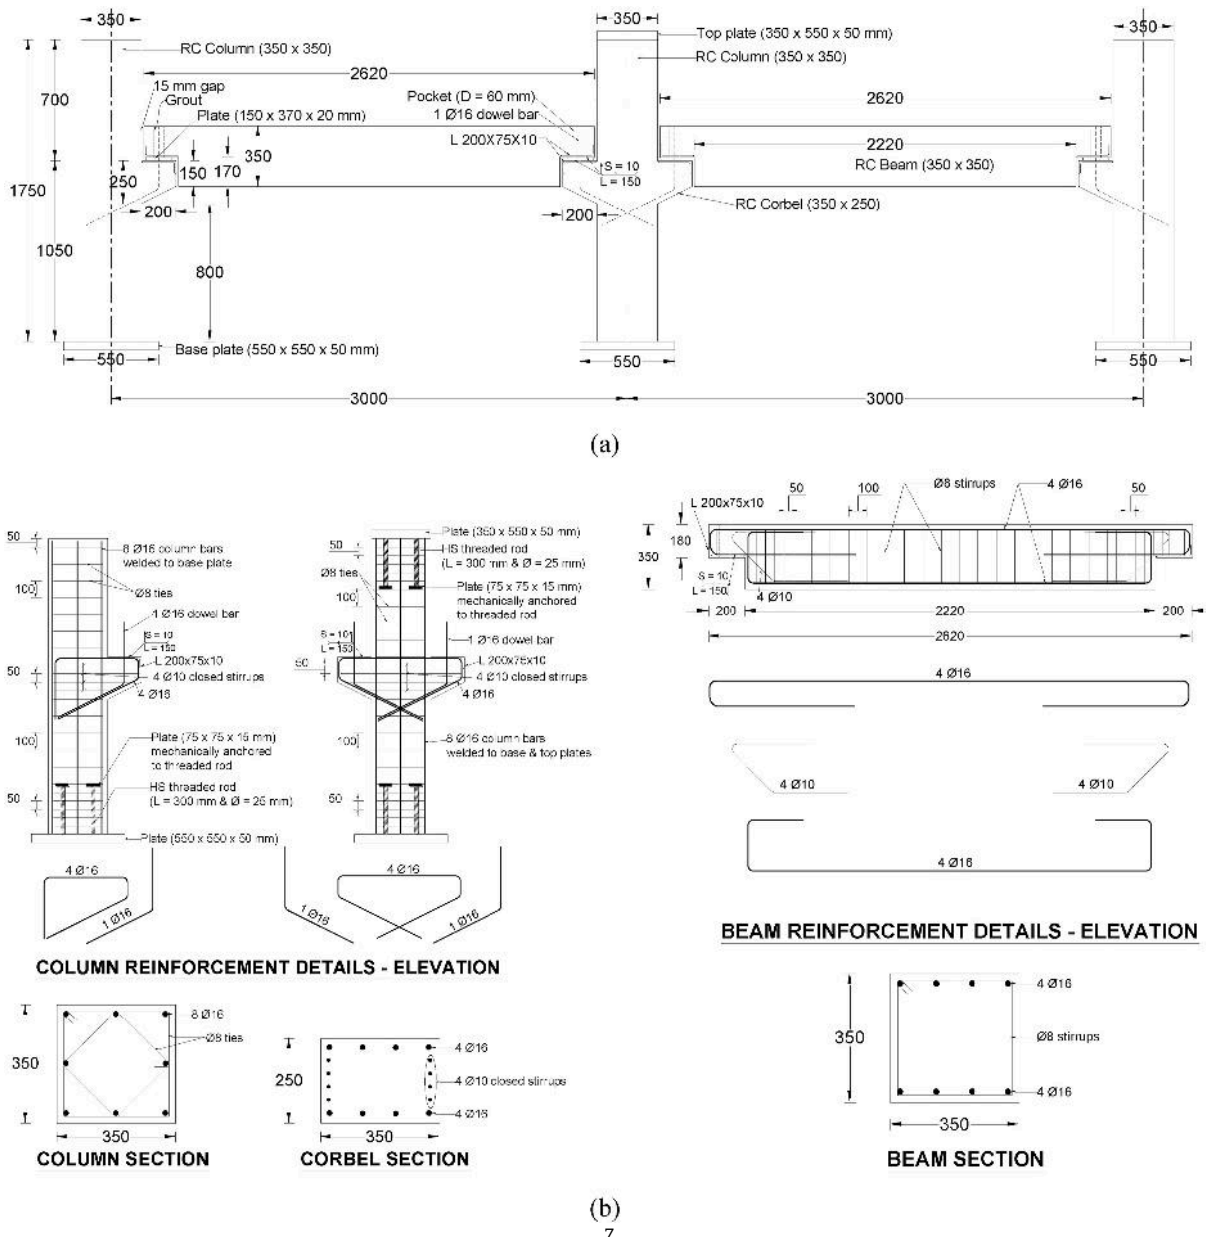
Details of precast assembly P-SC-T2-ANG [36] (Dimensions are measured in mm): (a) Concrete dimensions; (b) Reinforcement.
